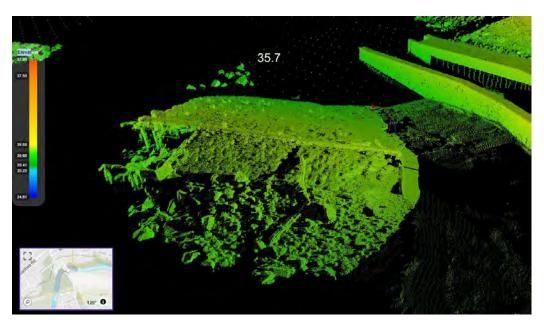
LiDAR scan of point cloud elevation data for the remaining weir on the right bank adjacent to the fish pass. Weir elevation data looking downstream (May 2021)
